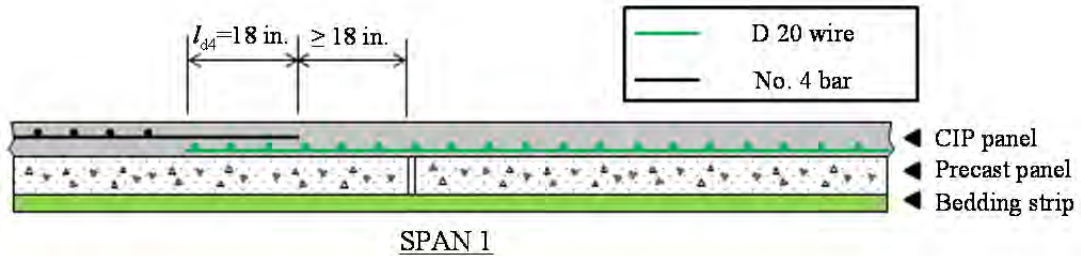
Details of longitudinal splices, Lampasas River Bridge (Section D-D)
